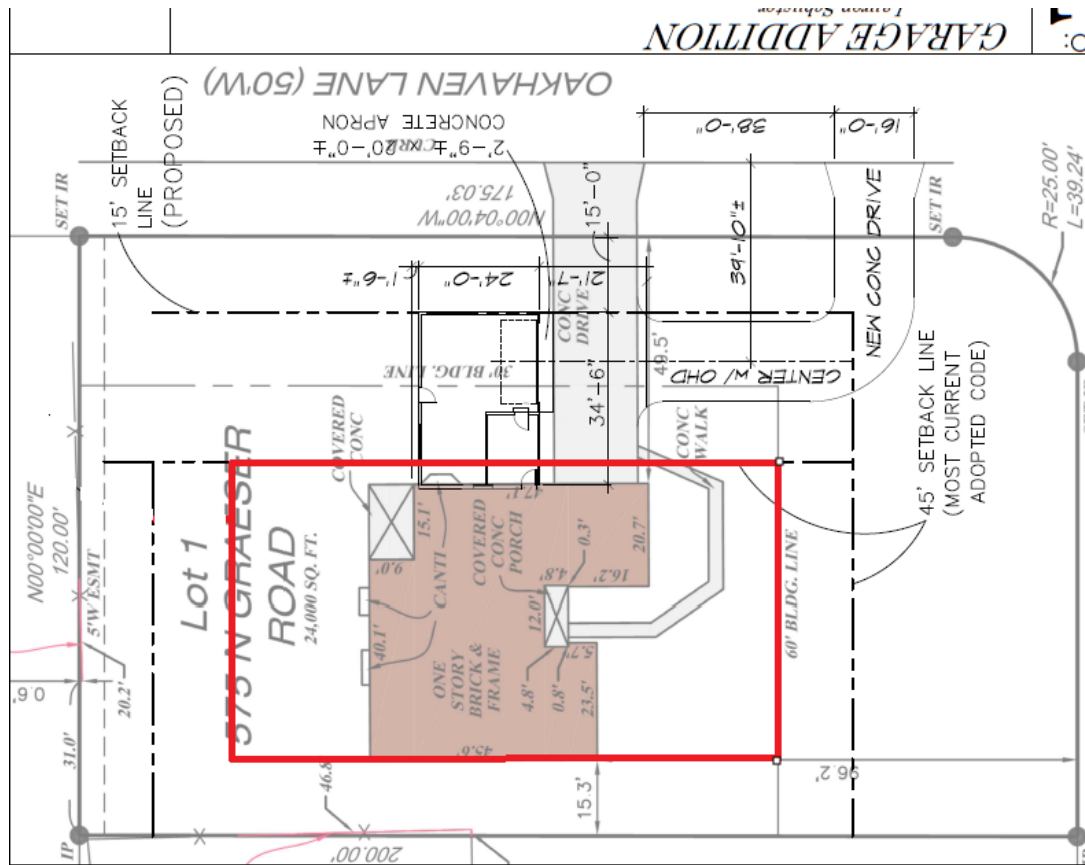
Applicant’s submitted site plan showing new addition and driveway with buildable area created by all setbacks in red.
